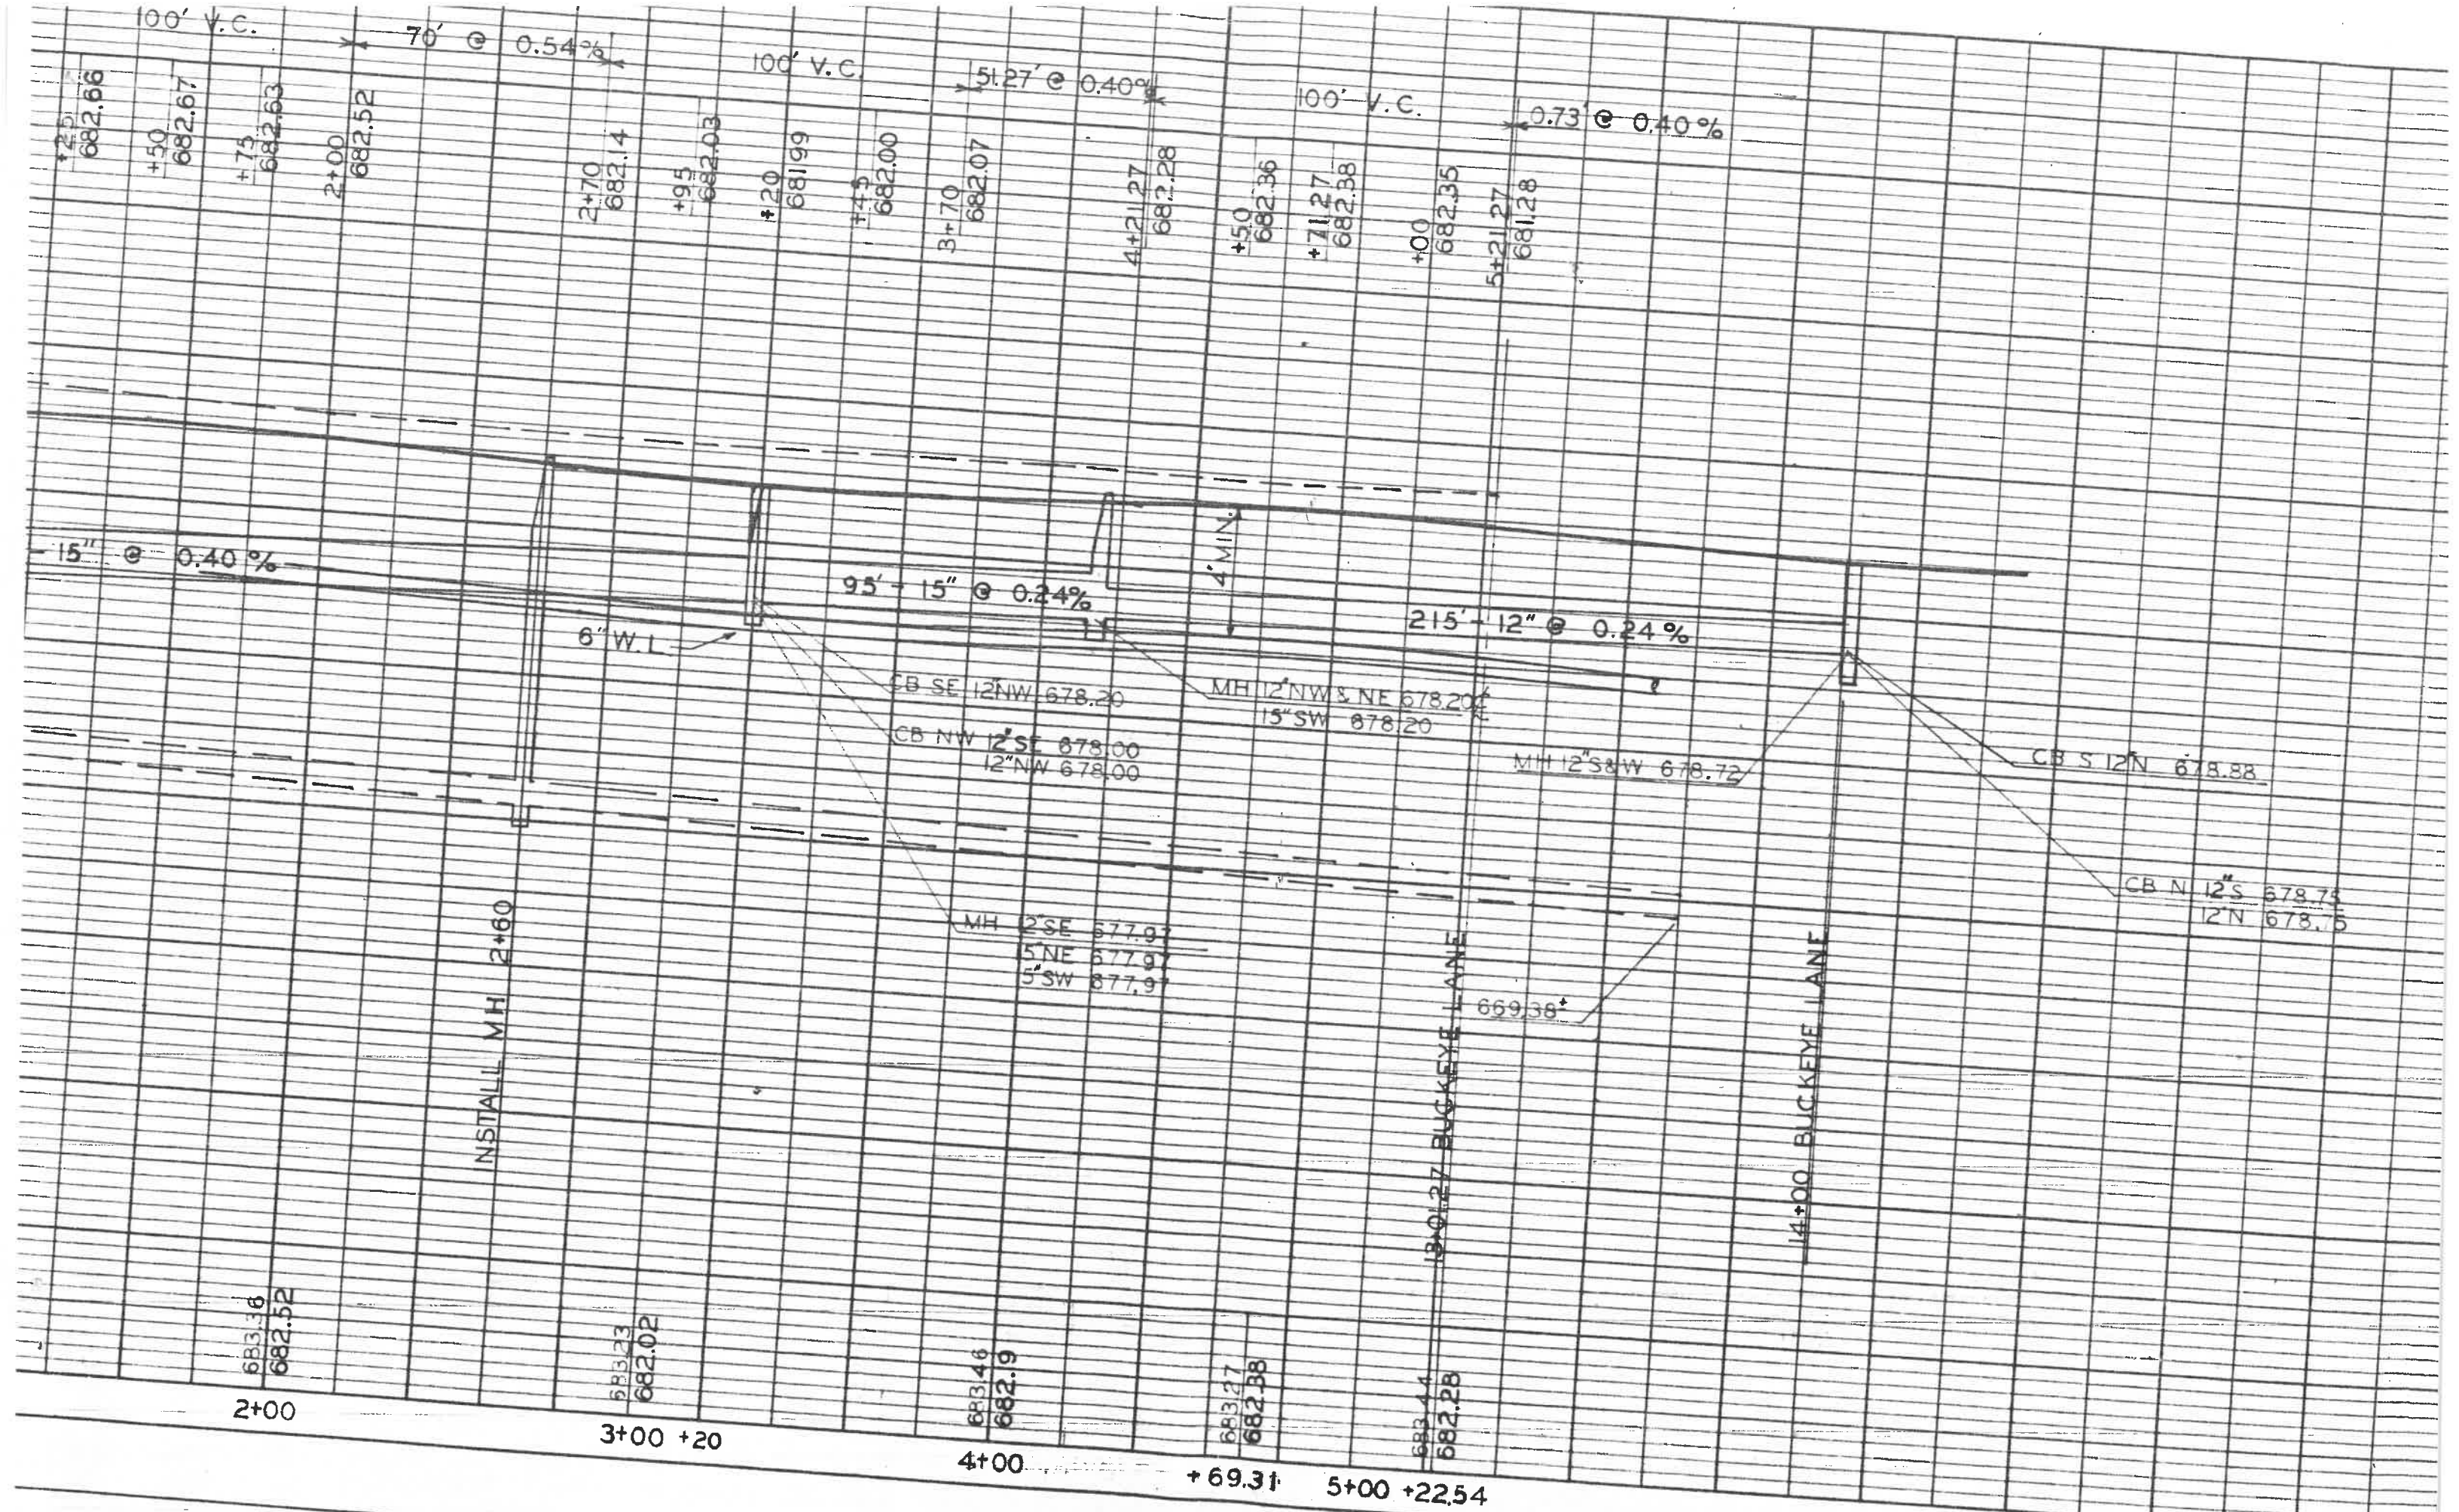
PLAN PROFILE B. P. R. STANDARD
